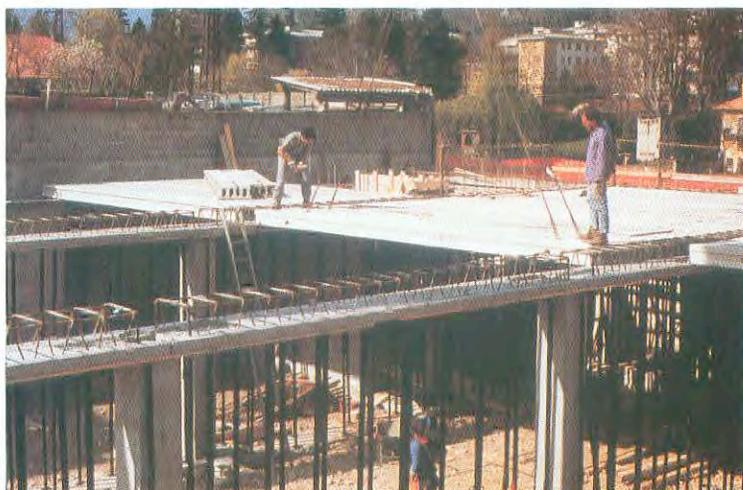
Precast soffit formwork used as permanent shuttering for *insitu* beams and long span floors.
